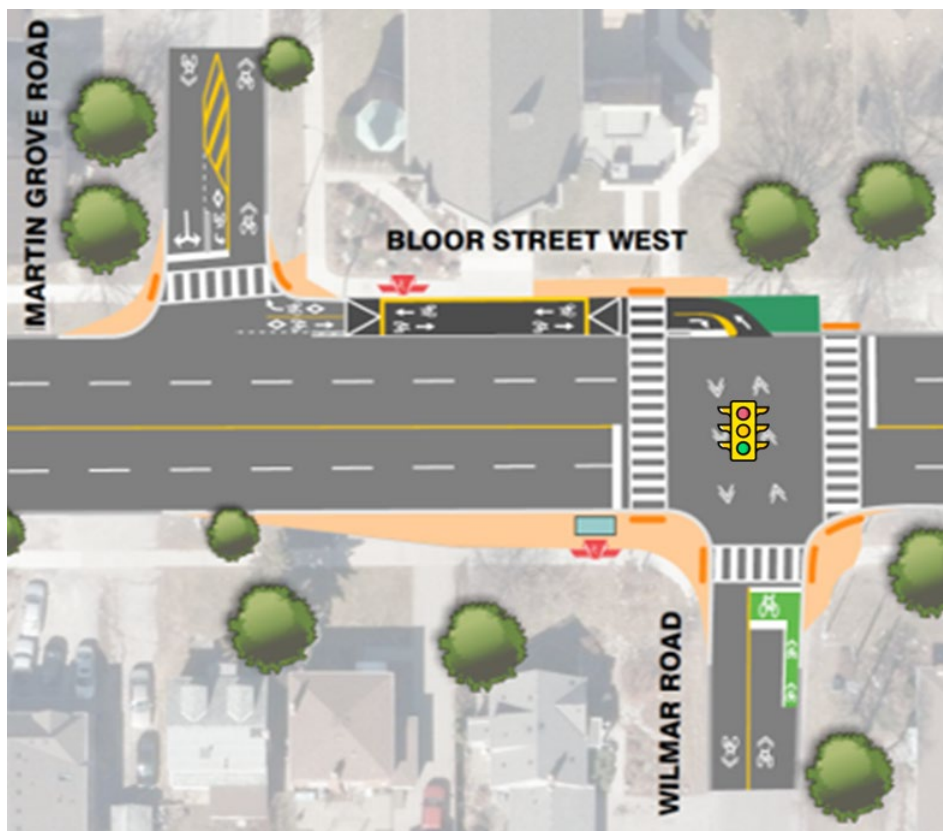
Proposed Intersection Improvements at Martin Grove Road, Wilmar Road, and Bloor Street West.
